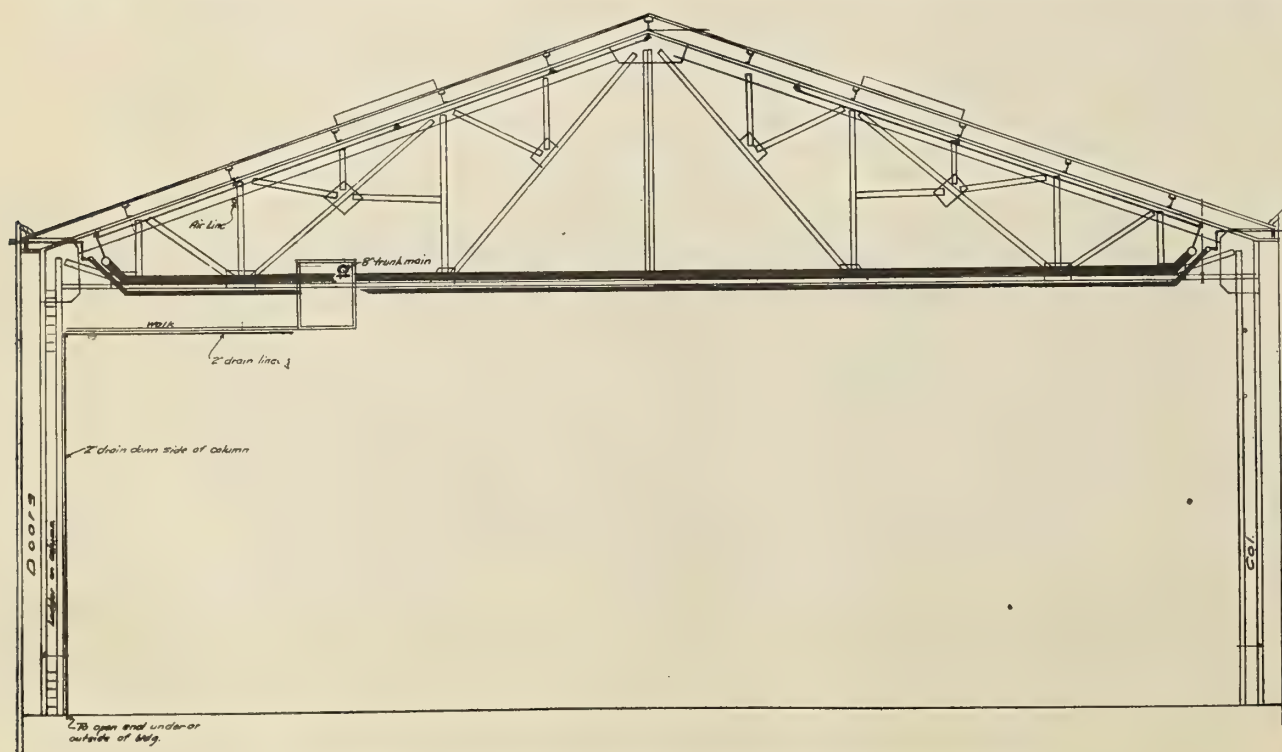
Section of Typical Pier Property Equipped with Automatic Sprinklers
